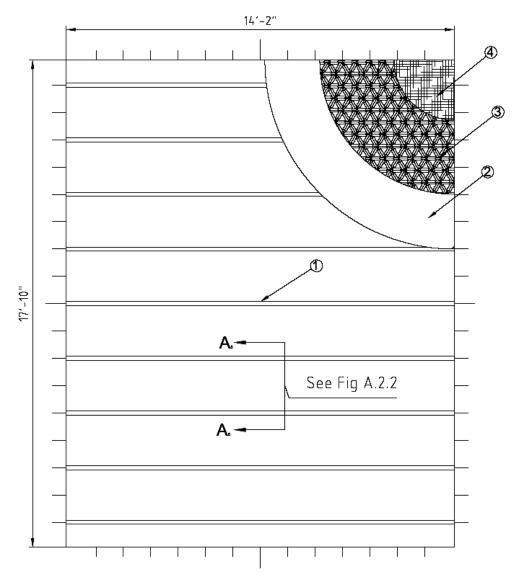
Loading and Instrumentation Layout (See Figure A.1.10).
